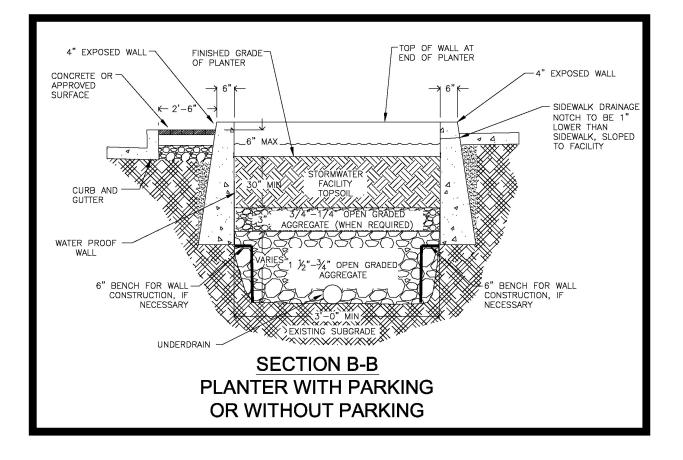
Green Streets Planter Section View With or Without Parking (source: Portland, 2011)
